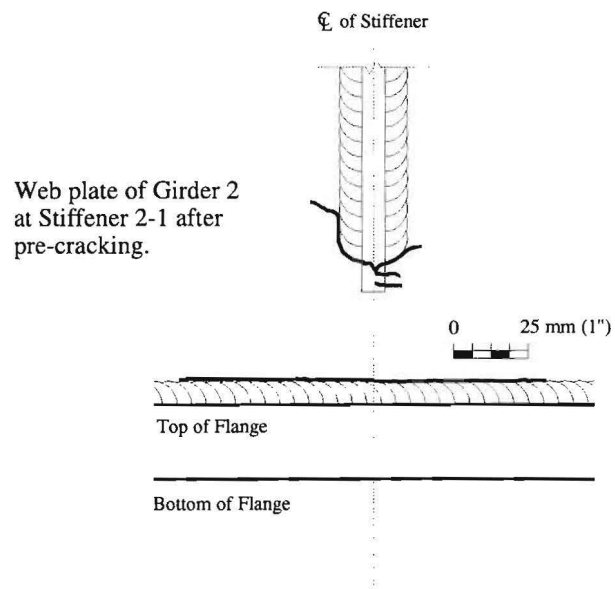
Pre-cracking in web plate of Girder 2 at weld toe of Stiffener 1.
